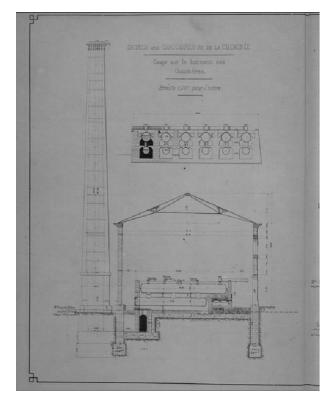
21. Original drawings of steam chimney of Lyon Water Pump Station
